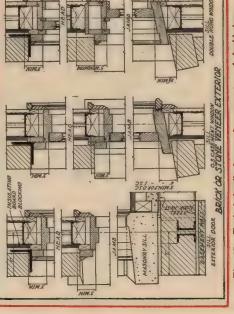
Typical details for wood casements and double-hung windows, showing blocking.
